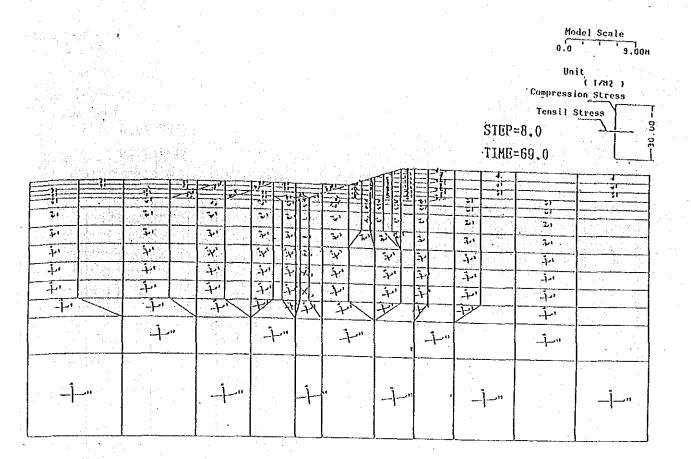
Stress Occuring in Improved Slope by Soil Cement Columns
